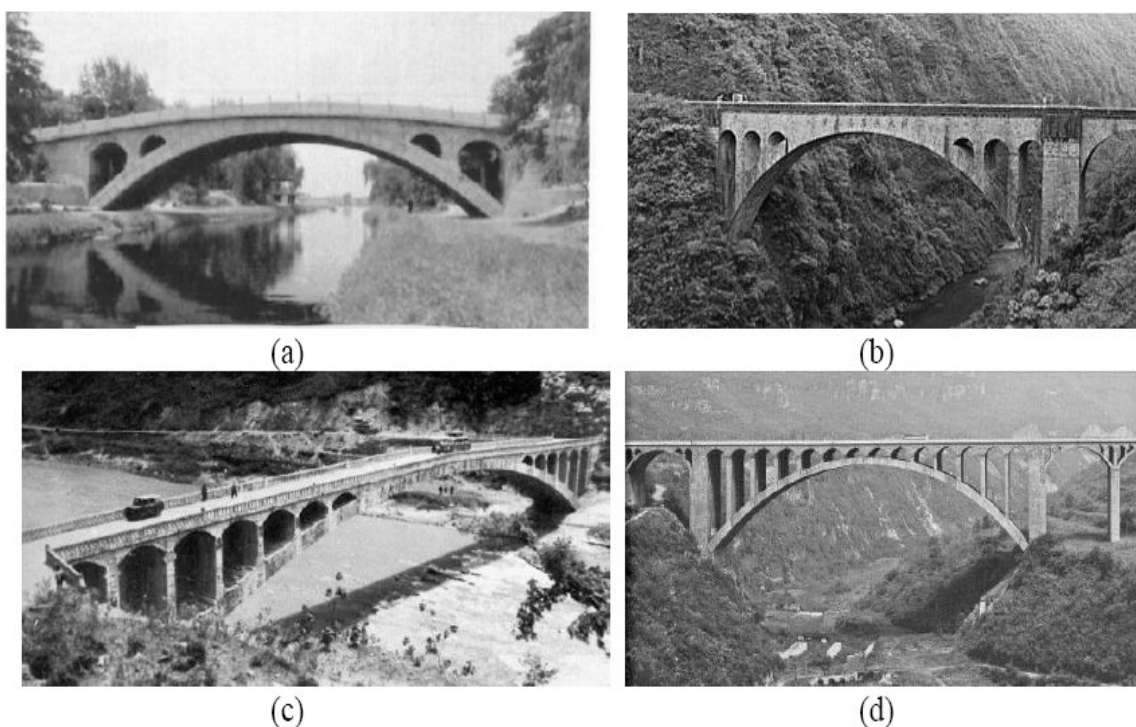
Some examples of open spandrel bridge in China, (a) Chawzhou Bridge, (b) Huanghugang Bridge, (c) Jiuxigou Bridge, (d) Danhe Bridge) (Wang et al. 2010)
